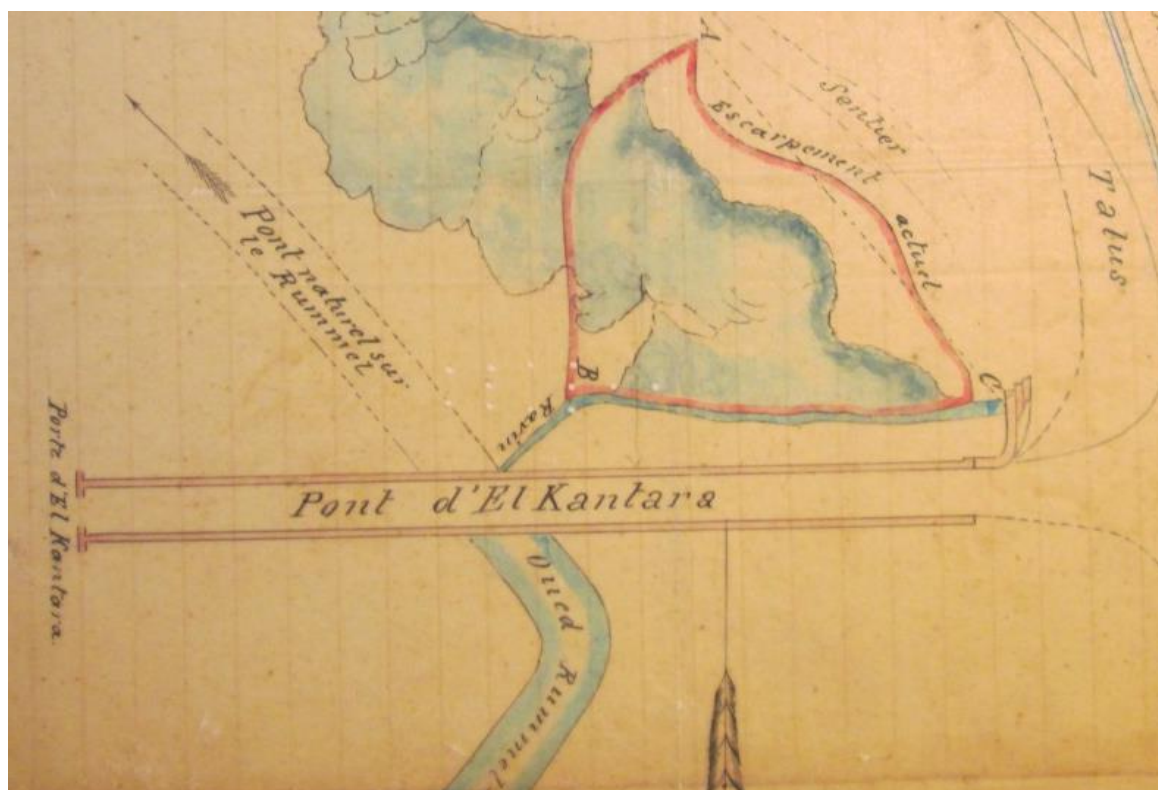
Plan of the El Kantara Bridge project, 1860.
